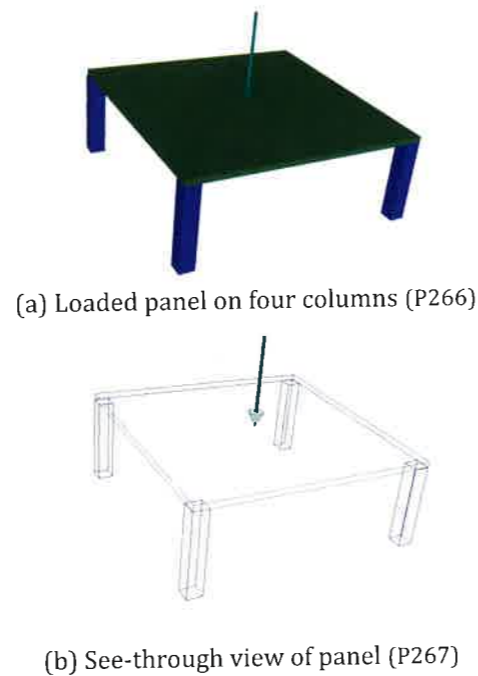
Panel on Four Columns Subject to a Central Point Load
